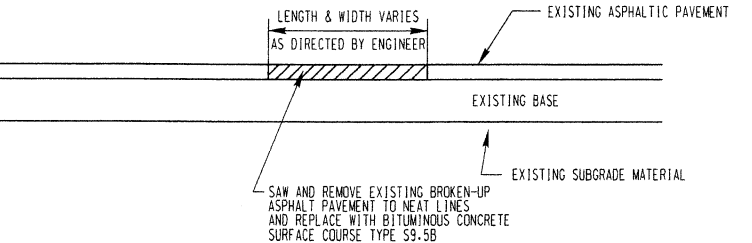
DETAILS OF REPAIRING EXISTING PAVEMENT PRIOR
